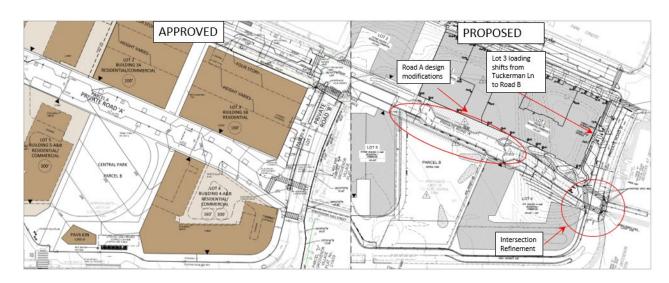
Preliminary Plan Amendment Changes (left side approved, right side proposed)
